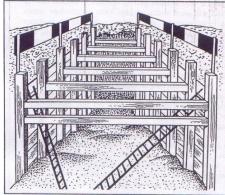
Barriers along the sides of an excavation to prevent workers falling into it
